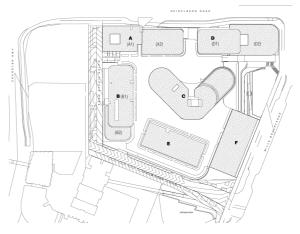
Excerpt from current (Amended) proposal Site Plan (drawing TPOO04).
